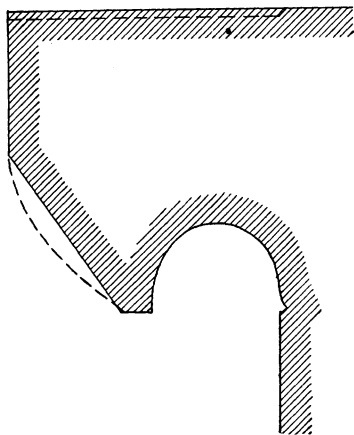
BLOCK MOULDING OF REAR GEISON. FULL SIZE.
